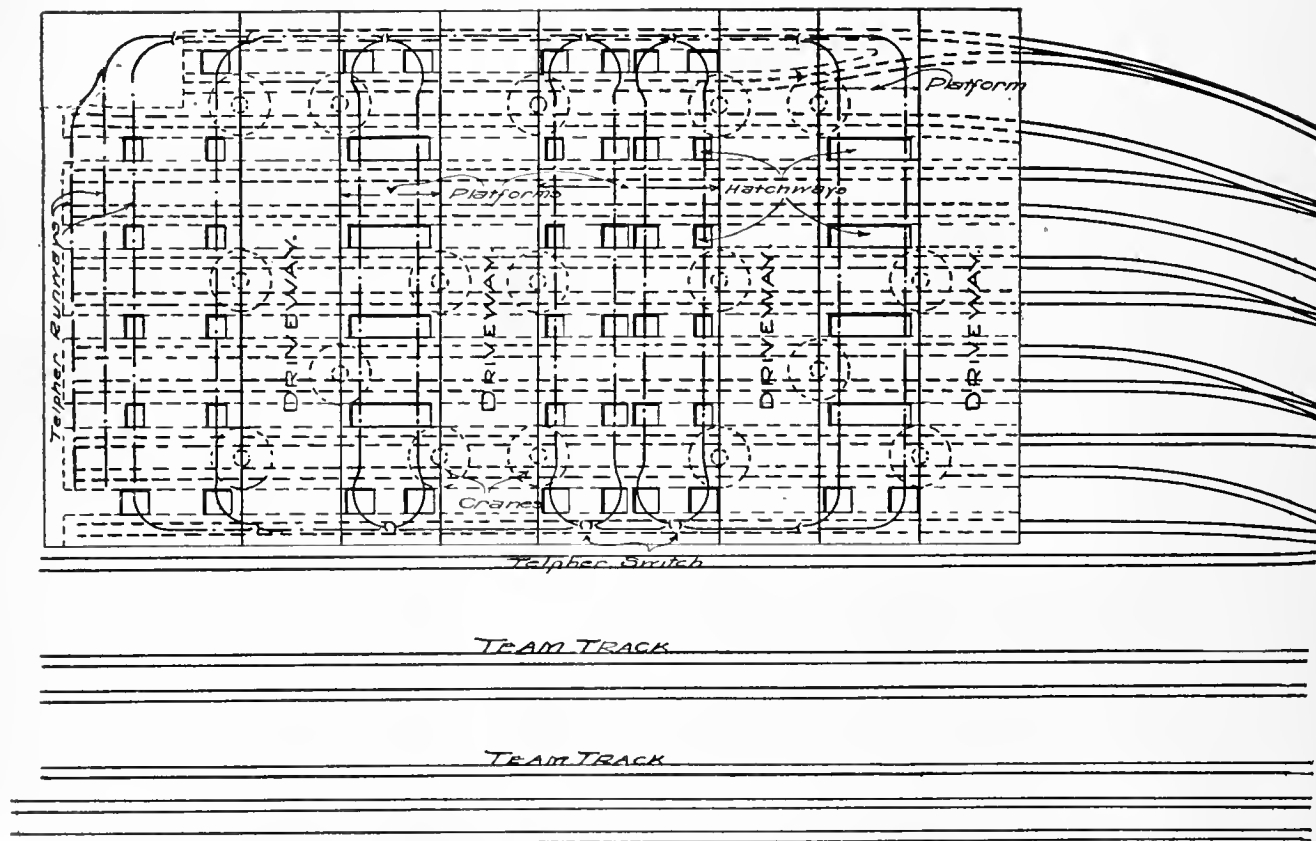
General Plan of Missouri, Kansas and Texas Terminal Company's Terminal at St. Louis.
